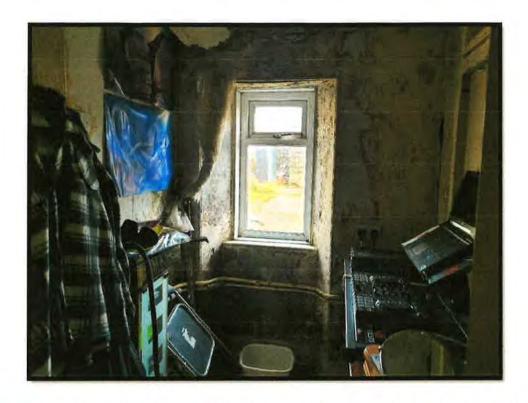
Left hand bedroom - Typical moisture reading 18%
